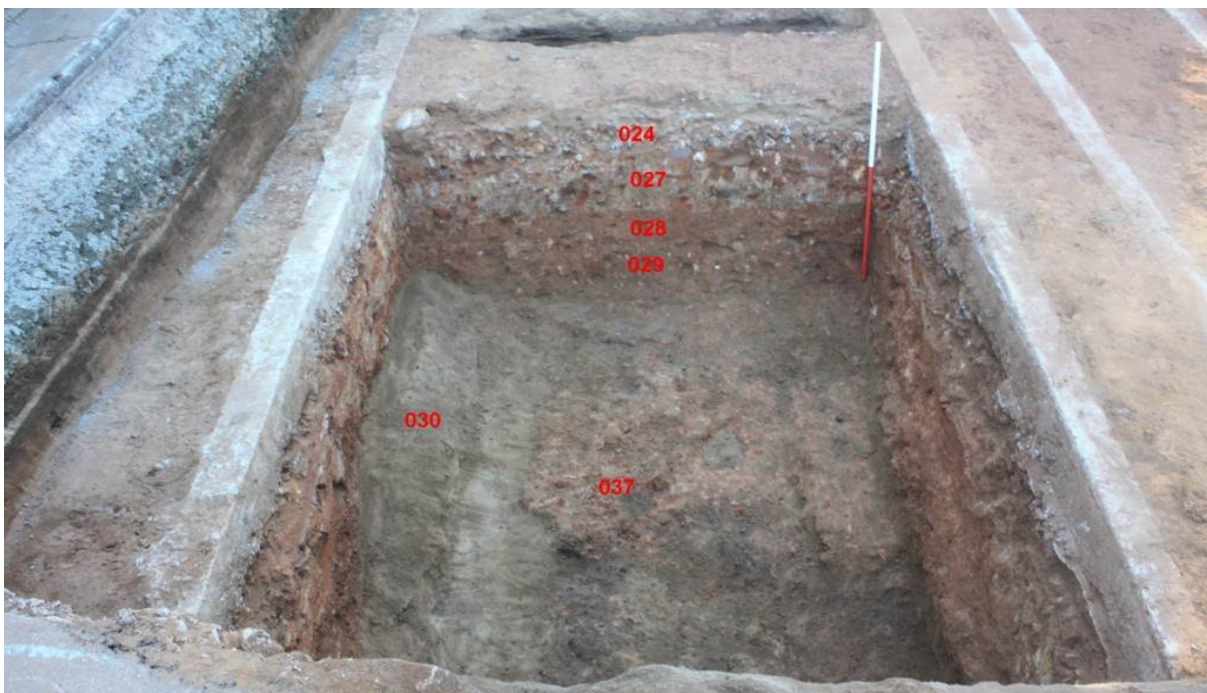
Test Trench 2, view west showing the stone and clay fill in section filling in the sloping cut below it; scale one metre.
